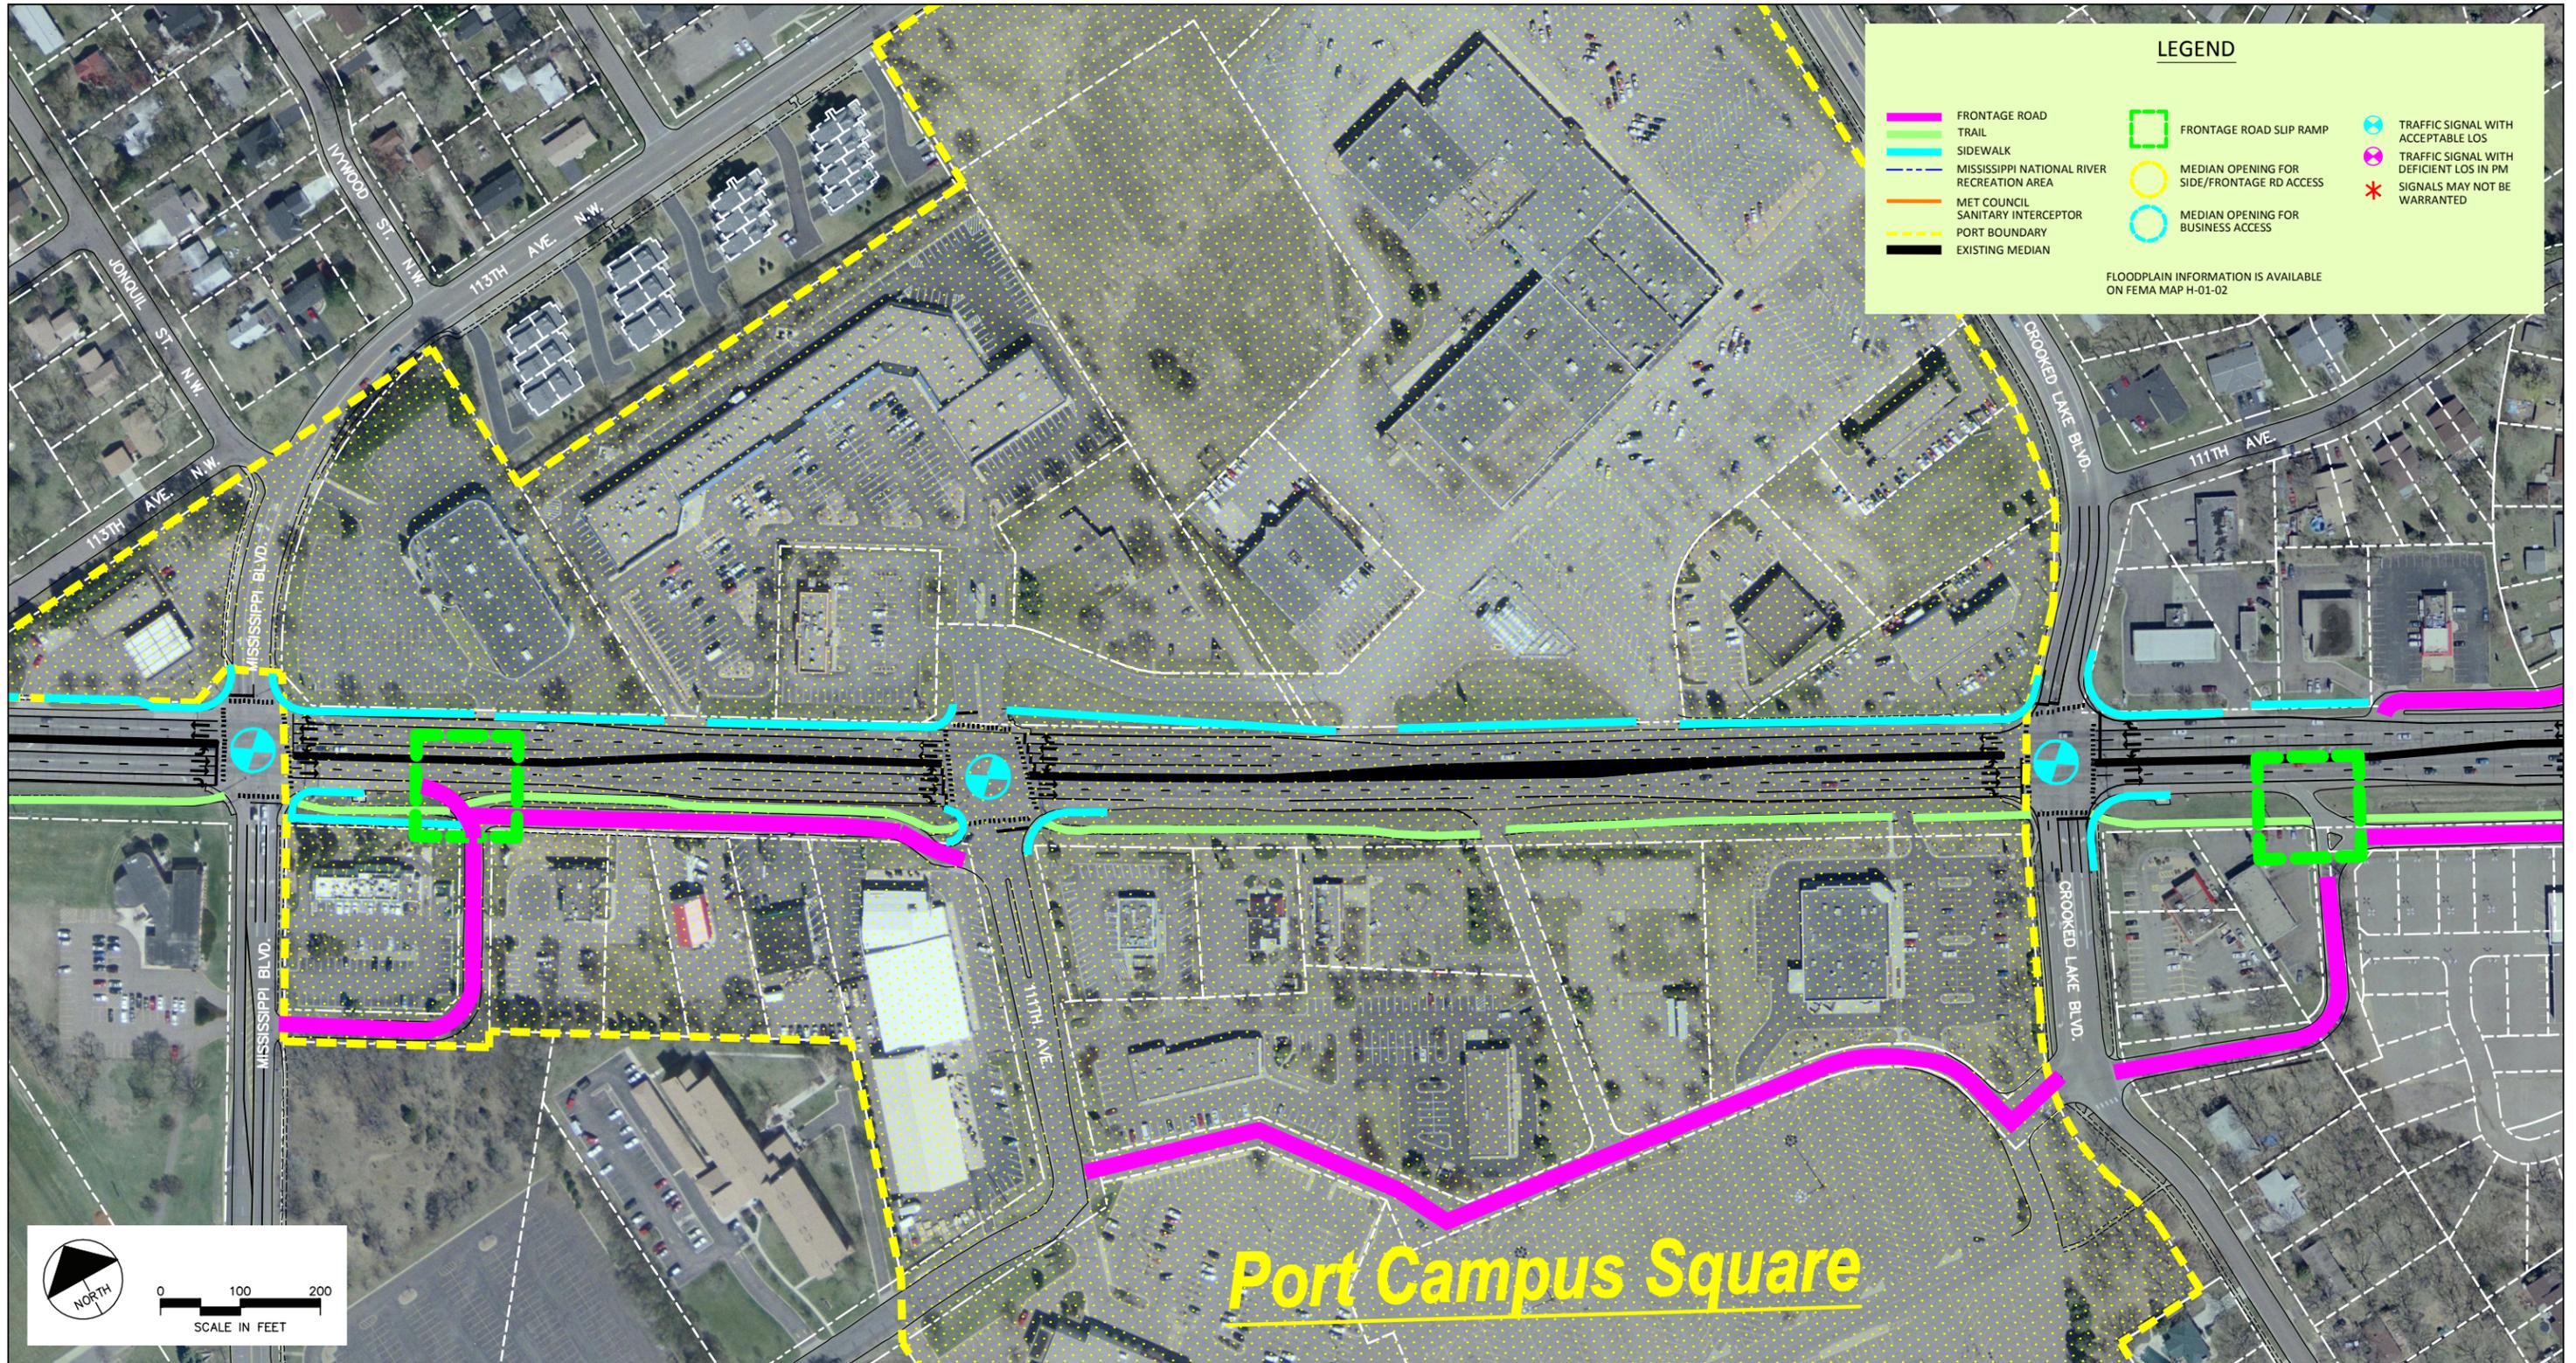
Existing Roadway Features (5 of 15)
